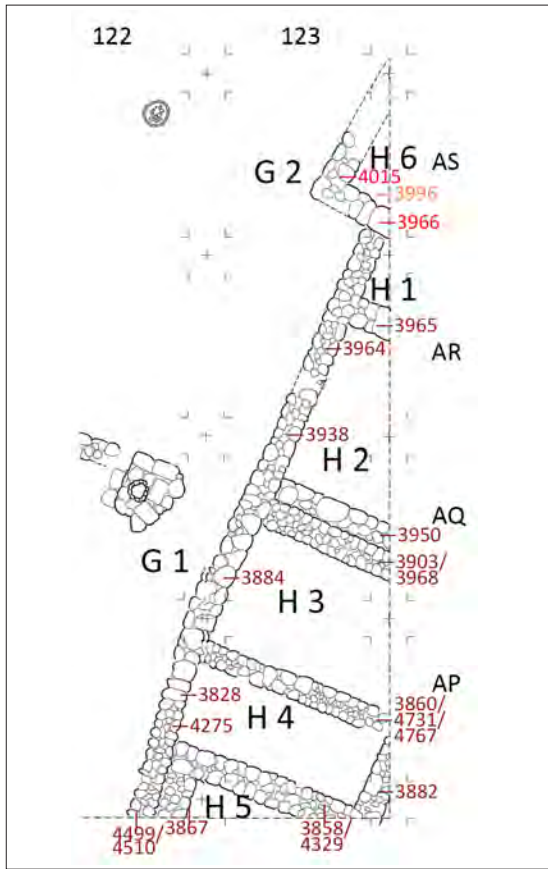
Plan of Complex H in Area I in Stratum 3 b (Source: BAI/GPIA).
